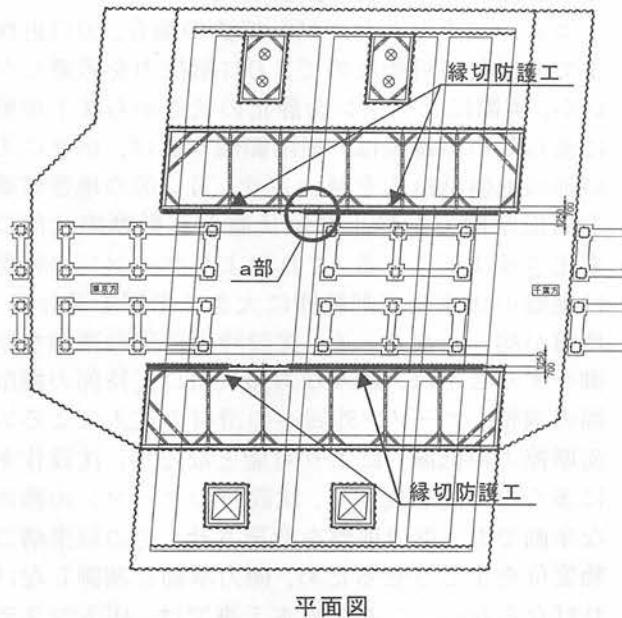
shows a detailed technical cross-section of a bridge pier foundation. The diagram illustrates the following key components and dimensions:
